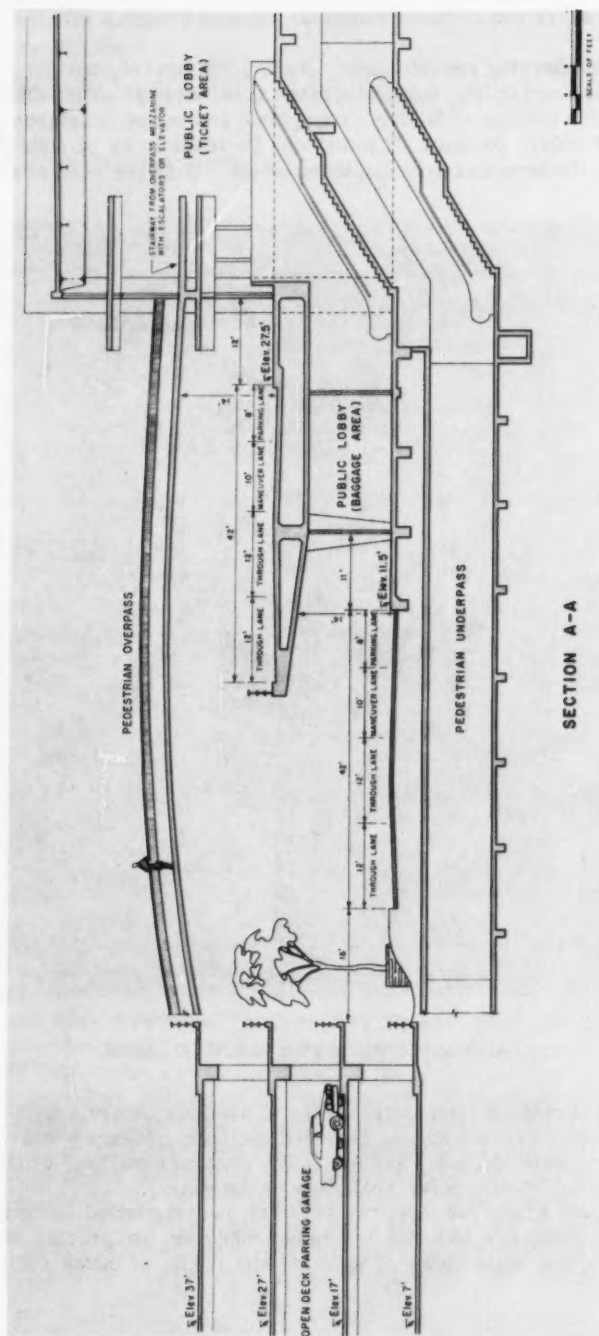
TYPICAL SECTION OF PARKING GARAGE AND ROADWAYS
